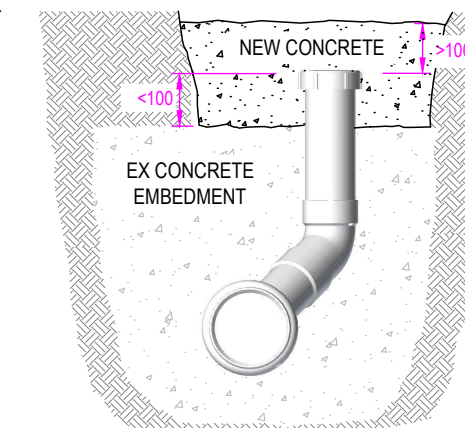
I: CONCRETE ENCASED CONNECTION CAP
